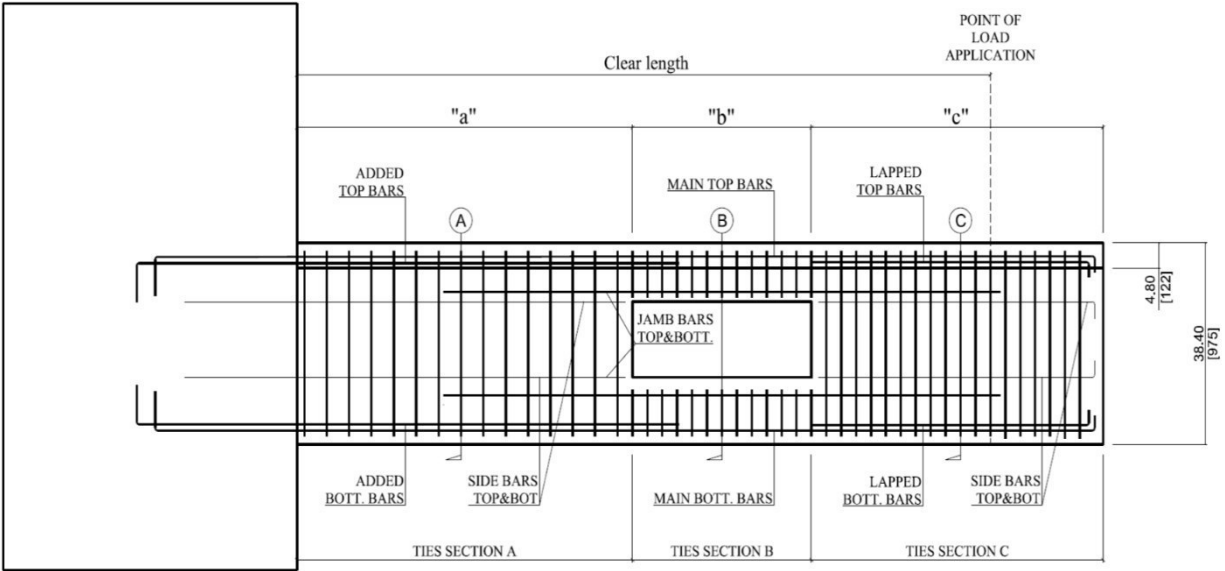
Elevation view of generic test specimen with geometry and reinforcement
